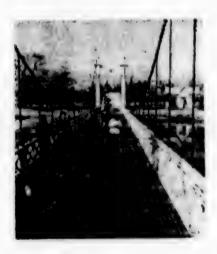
View of the Zalantan Suspension Bridge on the Yalu River in Butha Qi, Hulun Buir Meng, Nei Monggol AR. The bridge was built in 1905
